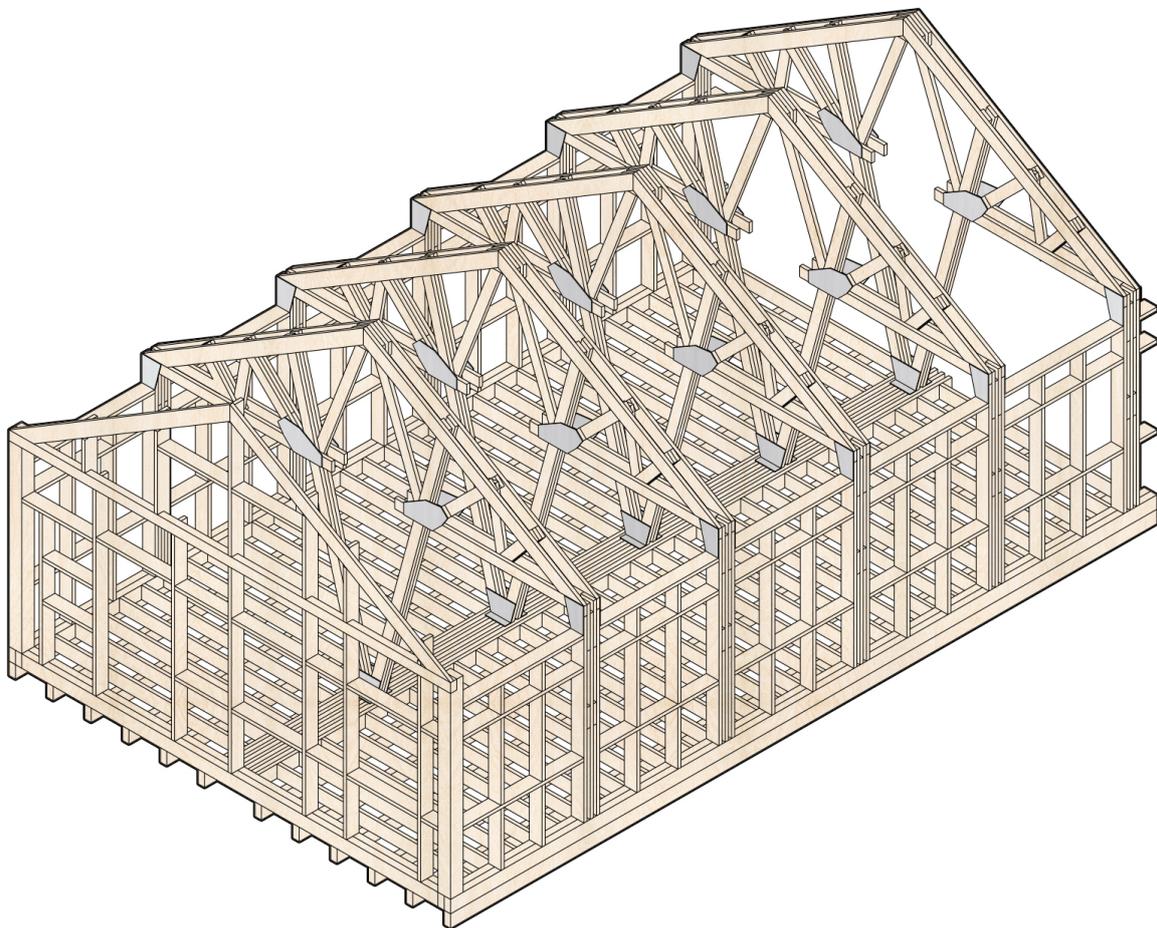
Construction stage 5 placing wall bracing between column to fix interior and exterior wall panel. Original author
